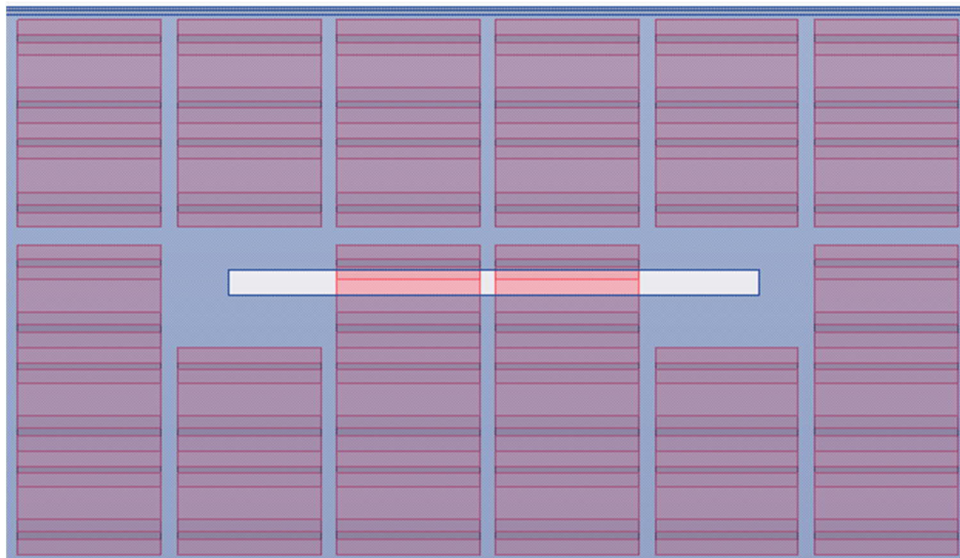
Small opening made by using the floor layout (Tekla Structures model snapshot)
